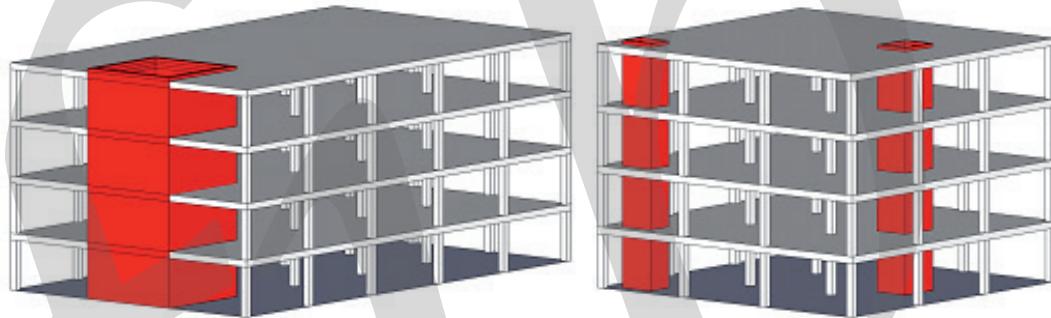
Shear wall configurations to be avoided: walls are not symmetrical in plan with respect to both orthogonal axes and severe torsional mechanism can develop (based on Chastre, Lúcio et al., 2012)
